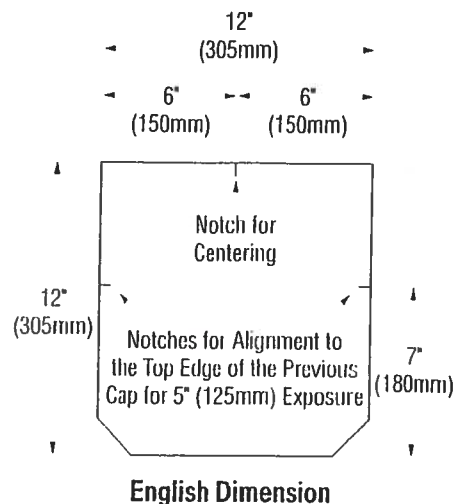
Each Shadow Ridge shingle has a centering notch and two side alignment notches to help ensure proper placement
